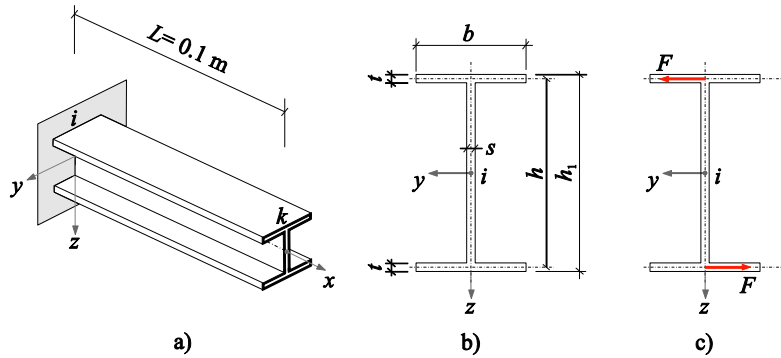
Cantilever beam with an I cross-section: a) system, b) cross-section, c) applied forces ($F = 114.3$ N)
